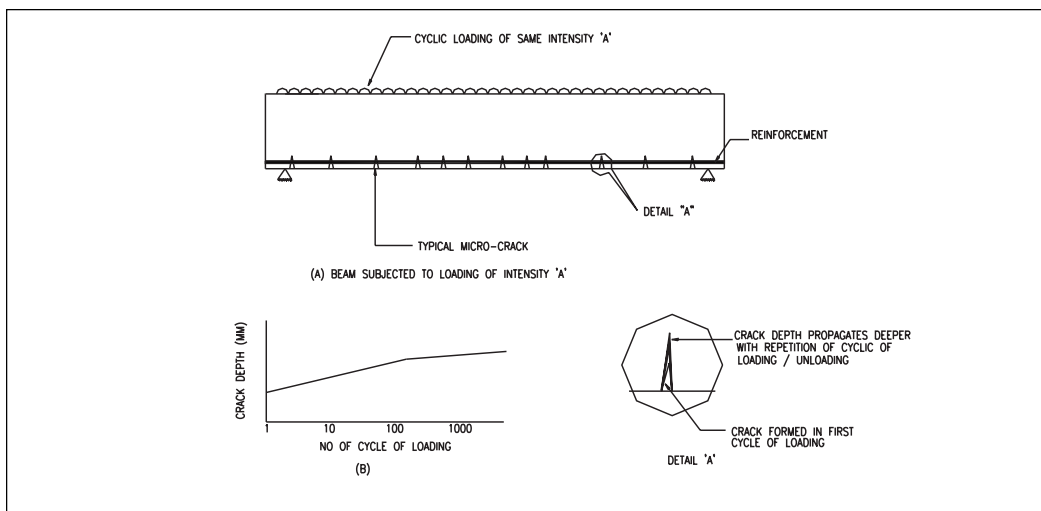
Crack propagation in tensile zone of an RCC beam.
